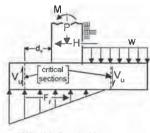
Example of Critical Section for Shem in Footings
